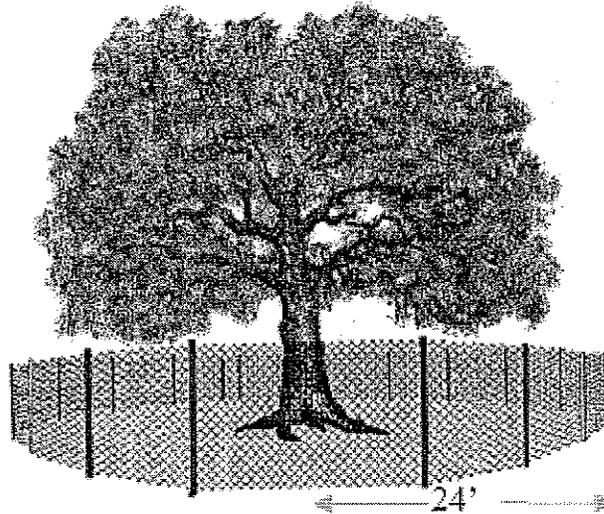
A 24 inch DBH tree would have a Tree Protection Zone (TPZ) extending 24 feet from the trunk.
